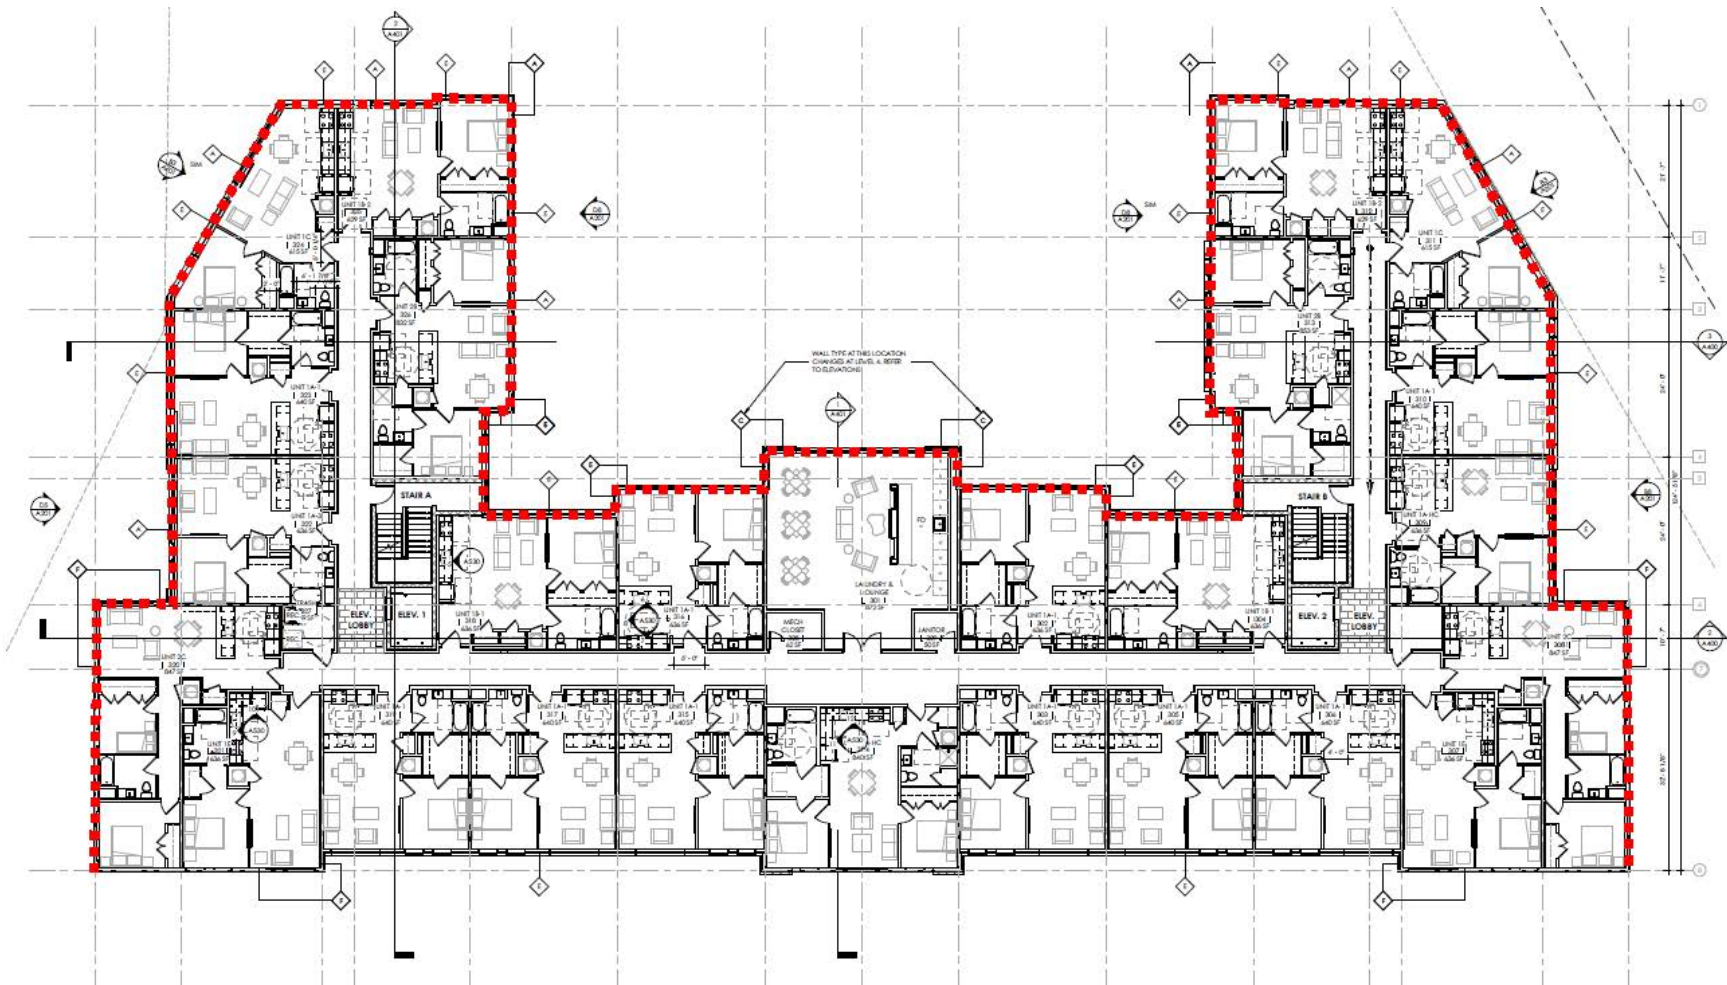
BUILDING FACADES REQUIRING MITIGATION
